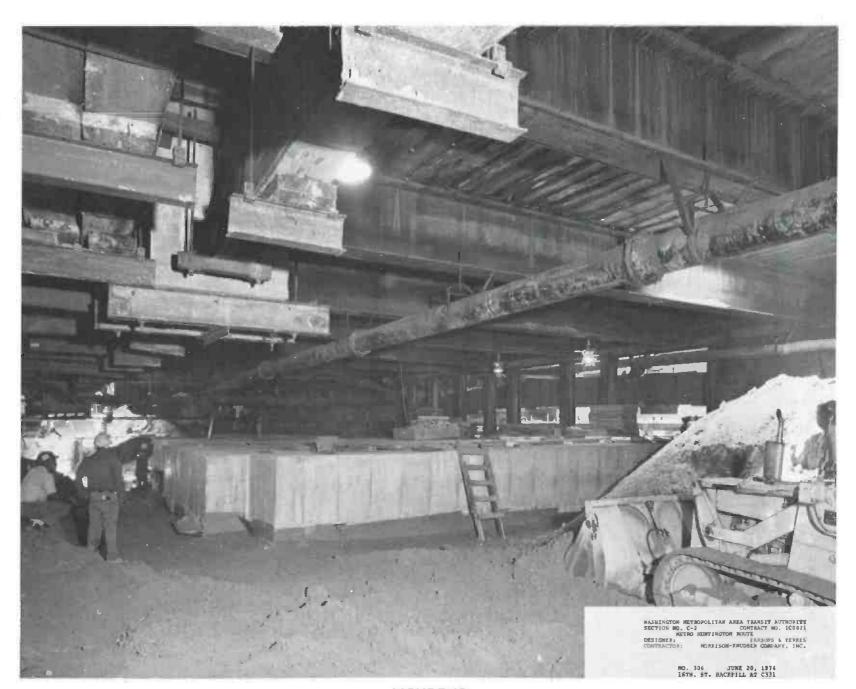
PIPES AND CONDUITS SUPPORTED BY HANGERS ATTACHED TO STREET DECKING
